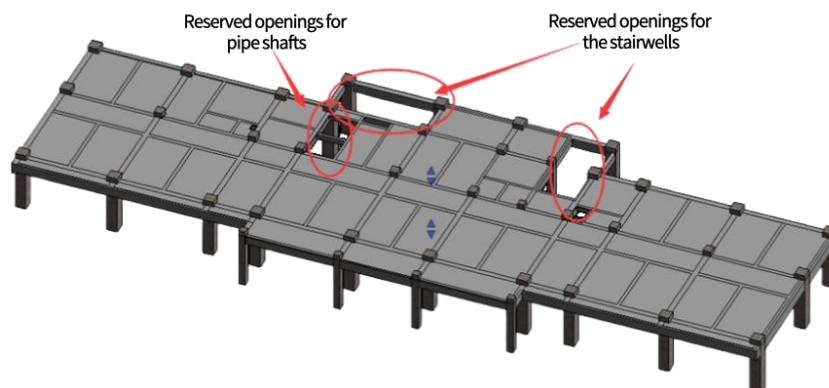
Distribution of Structural Columns on the First Floor Plan
